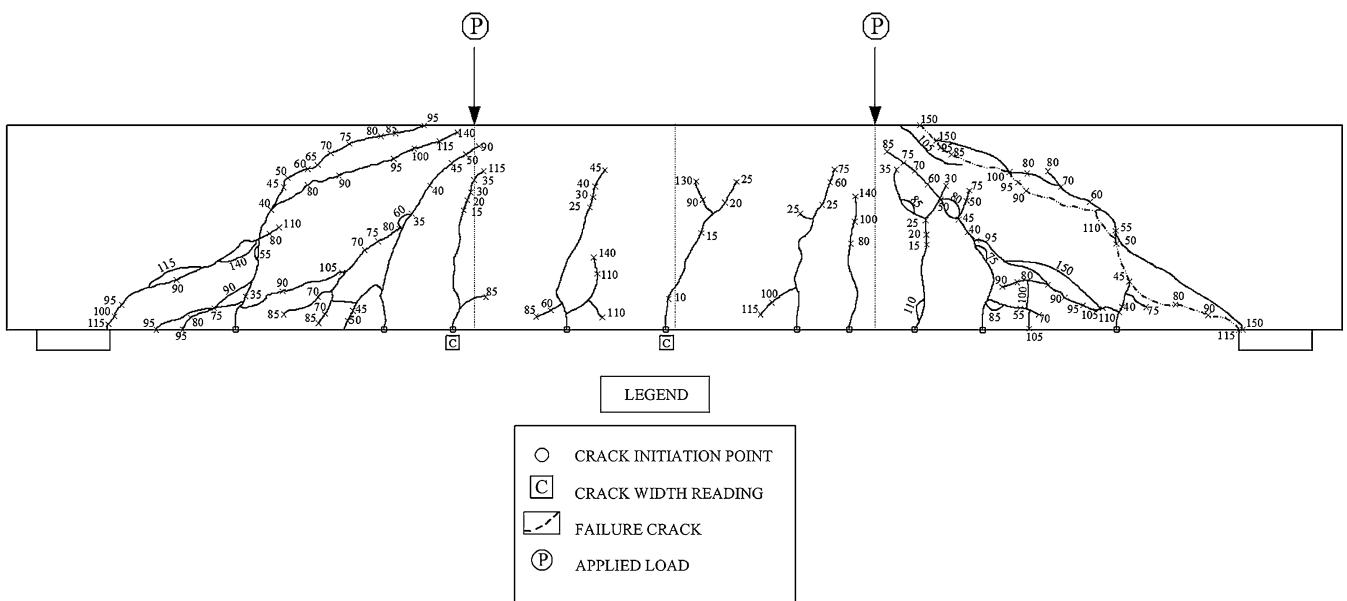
Crack pattern and mode of failure associated with beam SCC-SH-B1.
